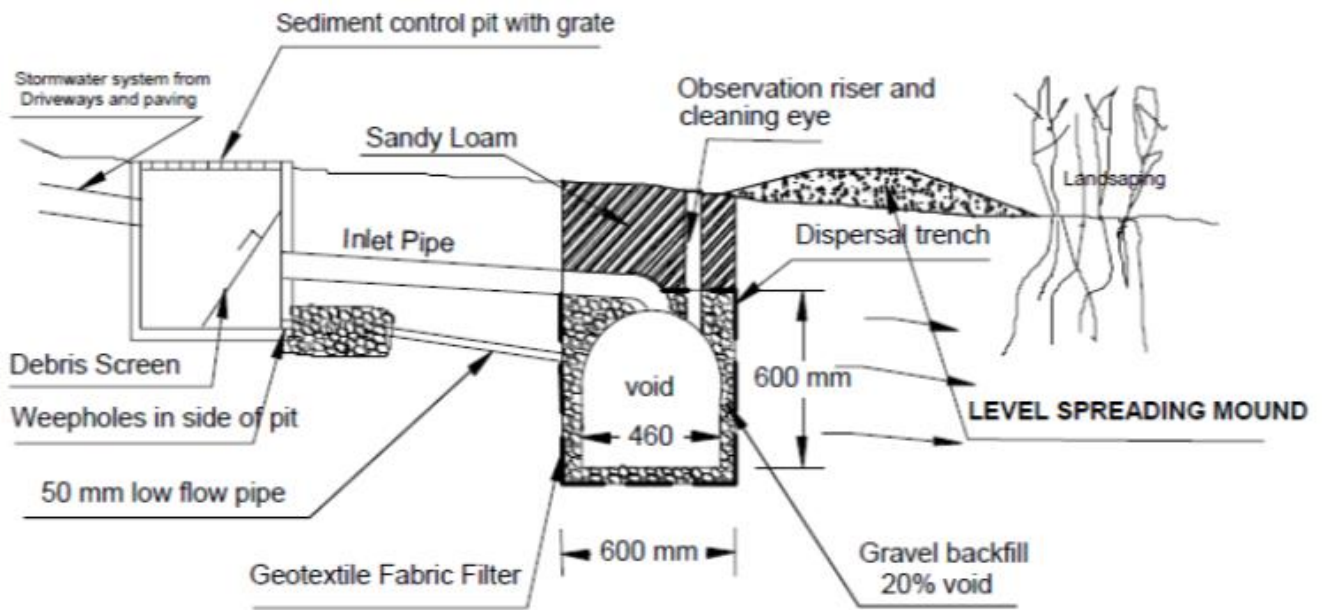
Typical details of Infiltration Trench sediment control and level spreader
